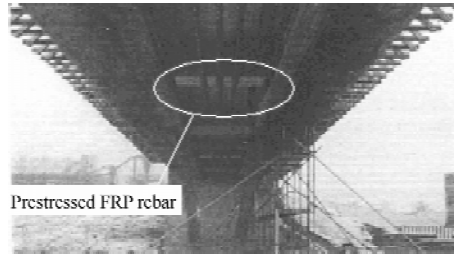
Eadolf - Berlin Arequipa Stewart footbridge
